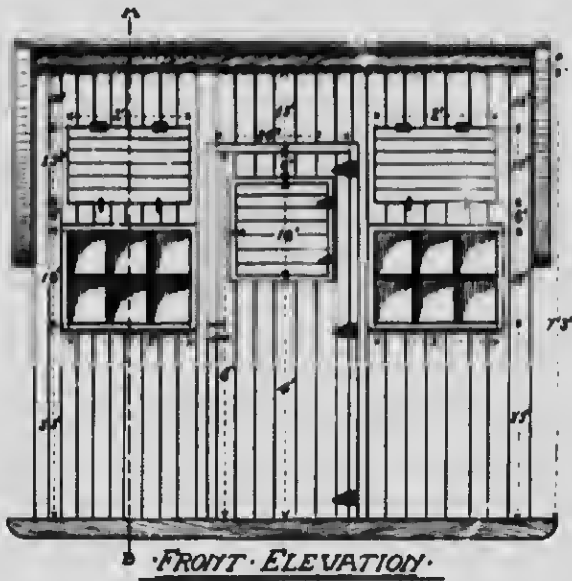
Showing front elevation of house in Fig. 35. The small ventilating door in this sketch is different from the door in the photograph and probably will tend to check any draught on the floor.
